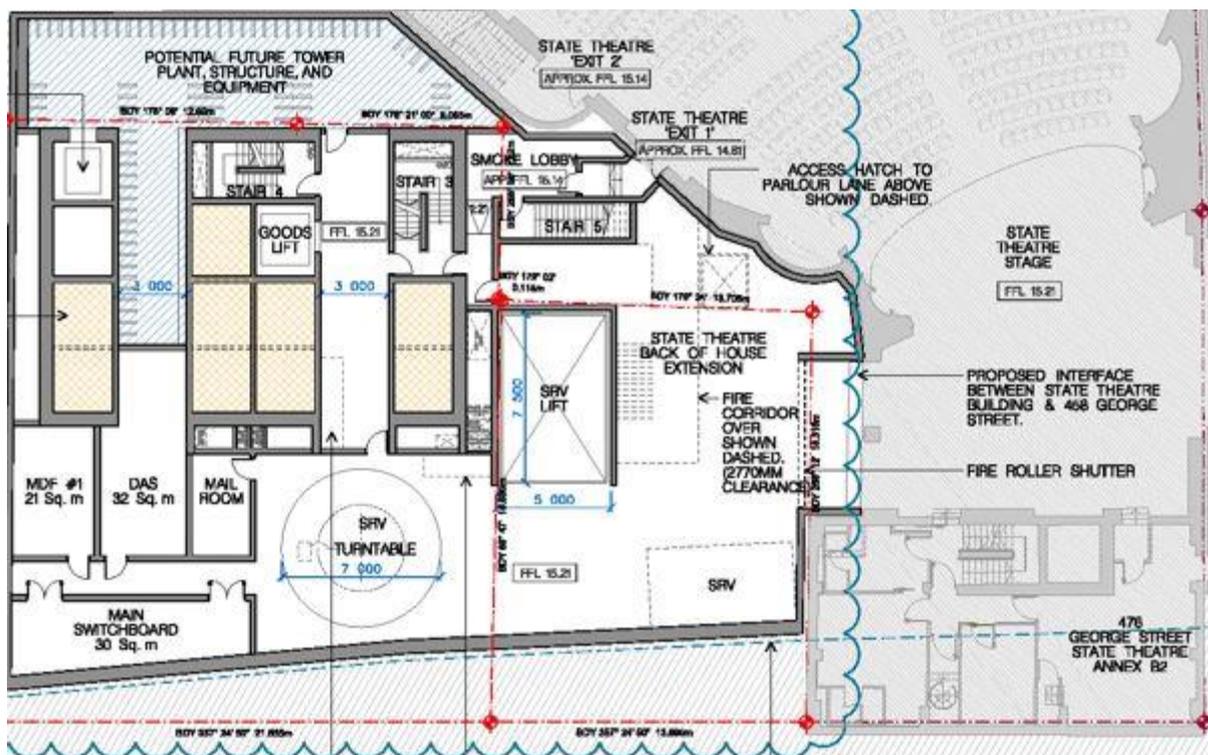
Extract of the basement level 1 floor plan, showing expanded back of house area, loading and servicing facilities and upgraded fire egress
